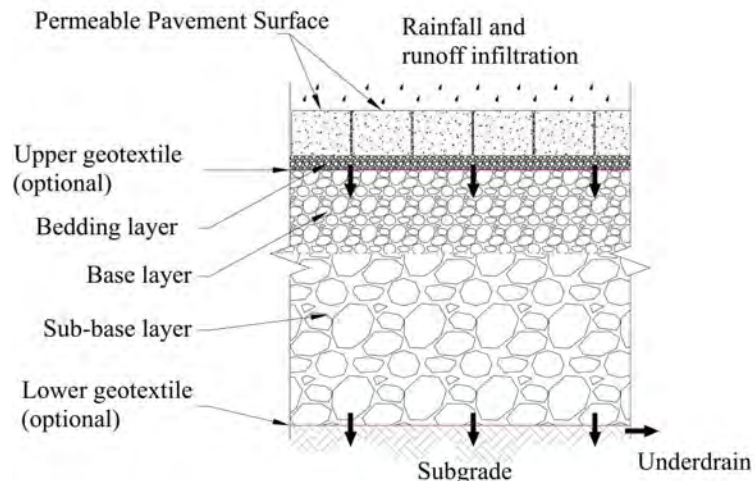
Cross section schematic of a permeable pavement system with geotextiles
